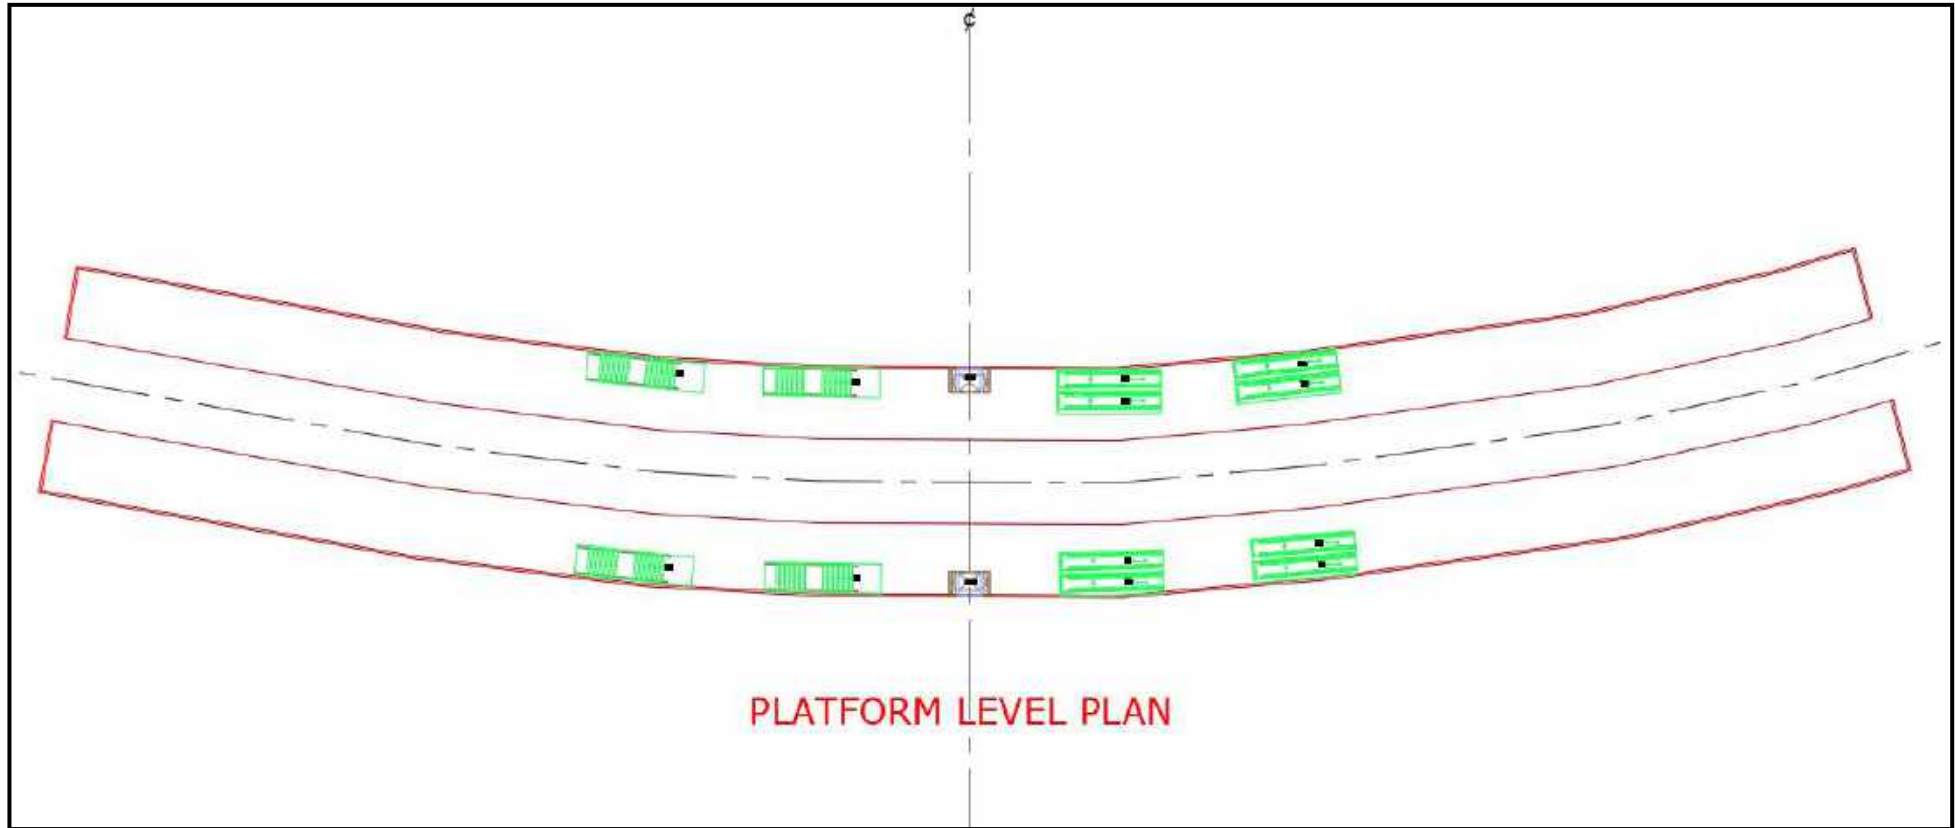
PROPOSED BENGALURU CANTONMENT STATION ON SITE
